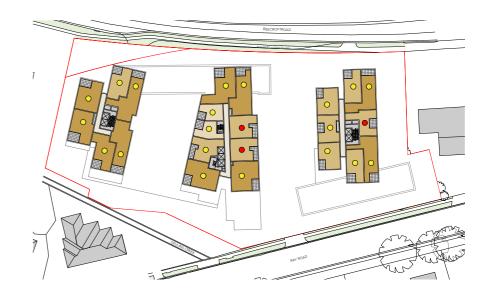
ADG - Ventilation and Solar Access. Amended and approved Design Report, 19.03.20, Rennett and Trimble.
